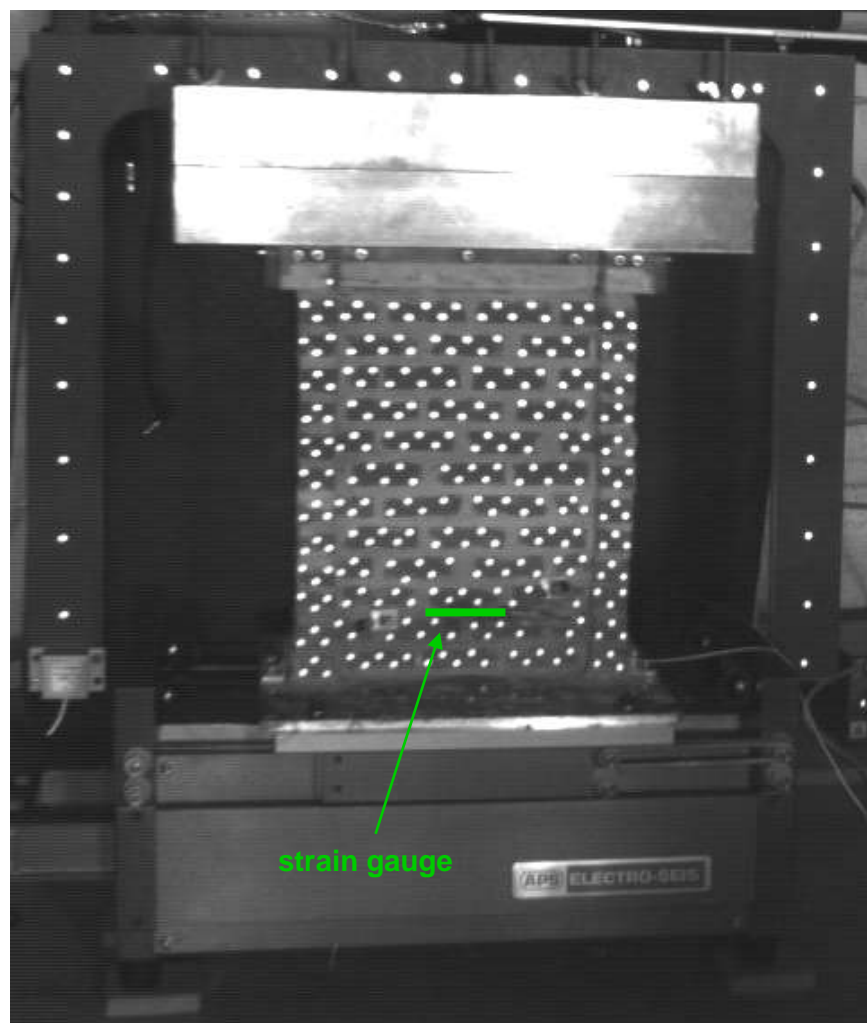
undamaged small-scale masonry specimen – exp 3
